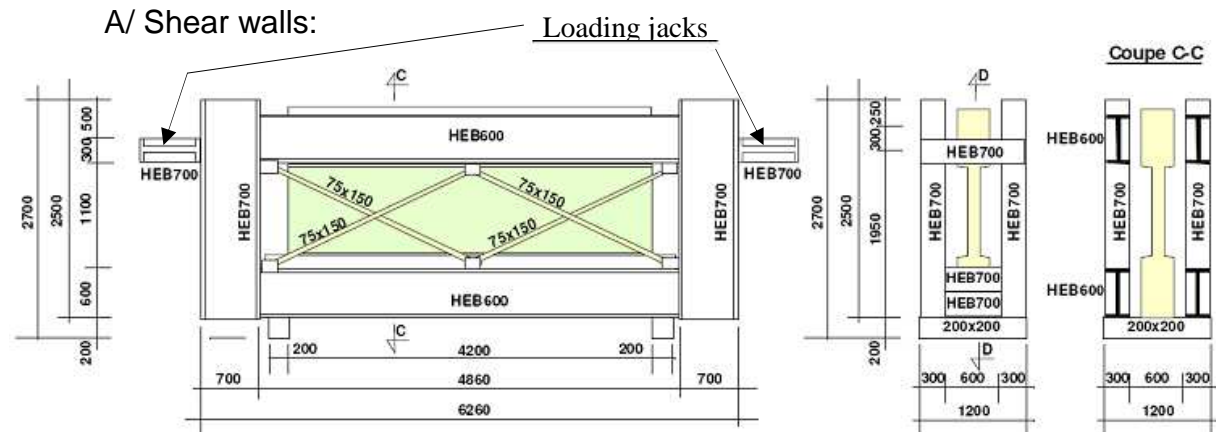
Shear wall specimens – left: wall on its testing bench - right: sectional elevation of the wall
